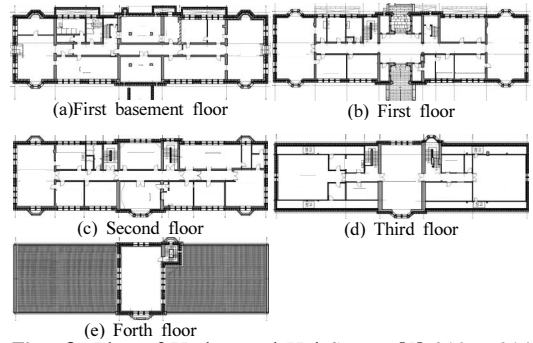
Plan of Underwood Hal Source:[5] 210 ~ 214
